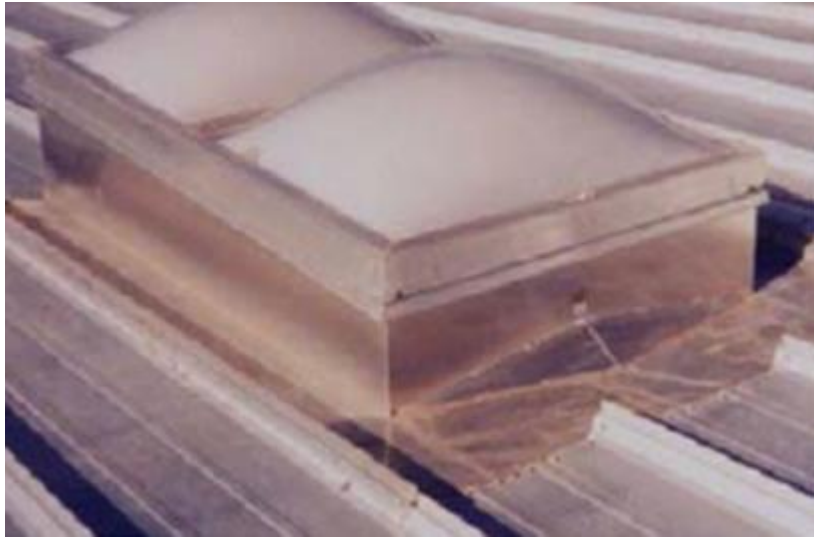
This under/over roof curb allows for the curb to be “shingled” into the roof to prevent roof leaks
